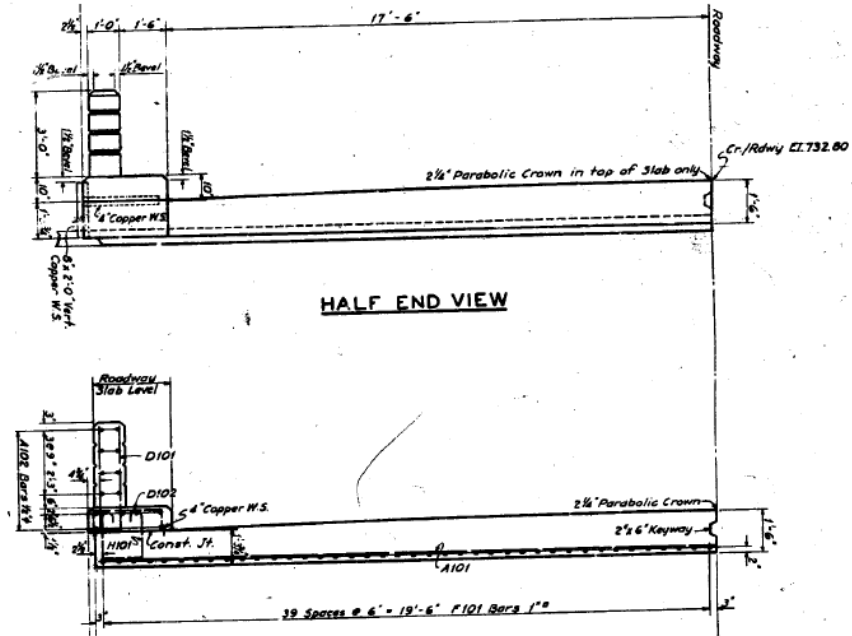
Cross Section of Reinforced Concrete Slab Bridge
